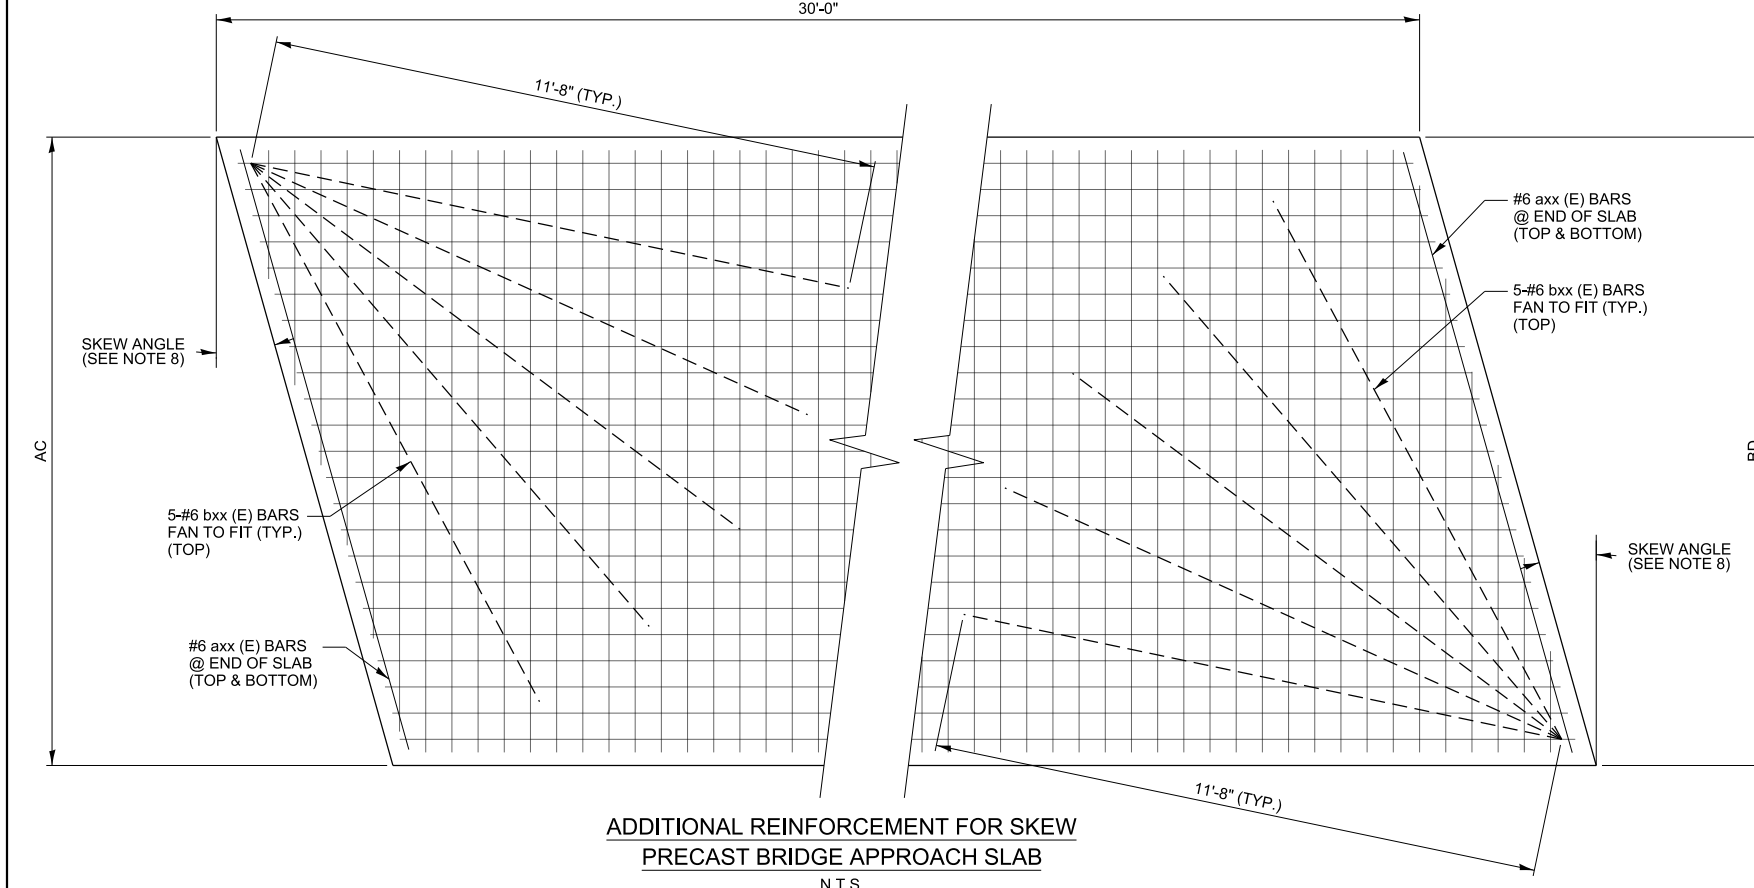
DETAILS PRESENTED IN THESE SHEETS SHALL NOT BE USED FOR SKEW GREATER THAN 45°.
